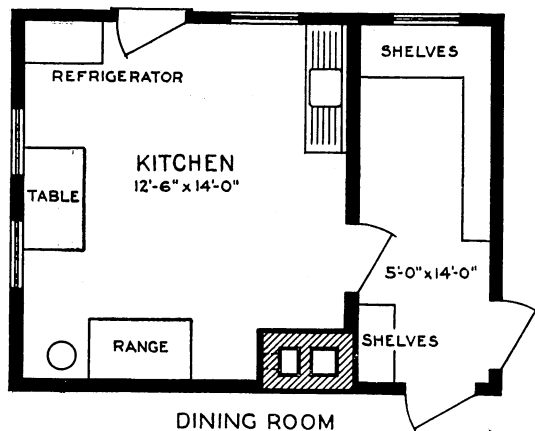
Plan for remodeling kitchen and pantry. In the second plan the kitchen is made smaller, work centers are brought closer together, a direct connection is made to the dining room, and the adjoining room is made large enough for a laundry or a bedroom. The walls around the range in the recess must be made fireproof. A view of one corner of the remodeled kitchen is given in Figure 28
